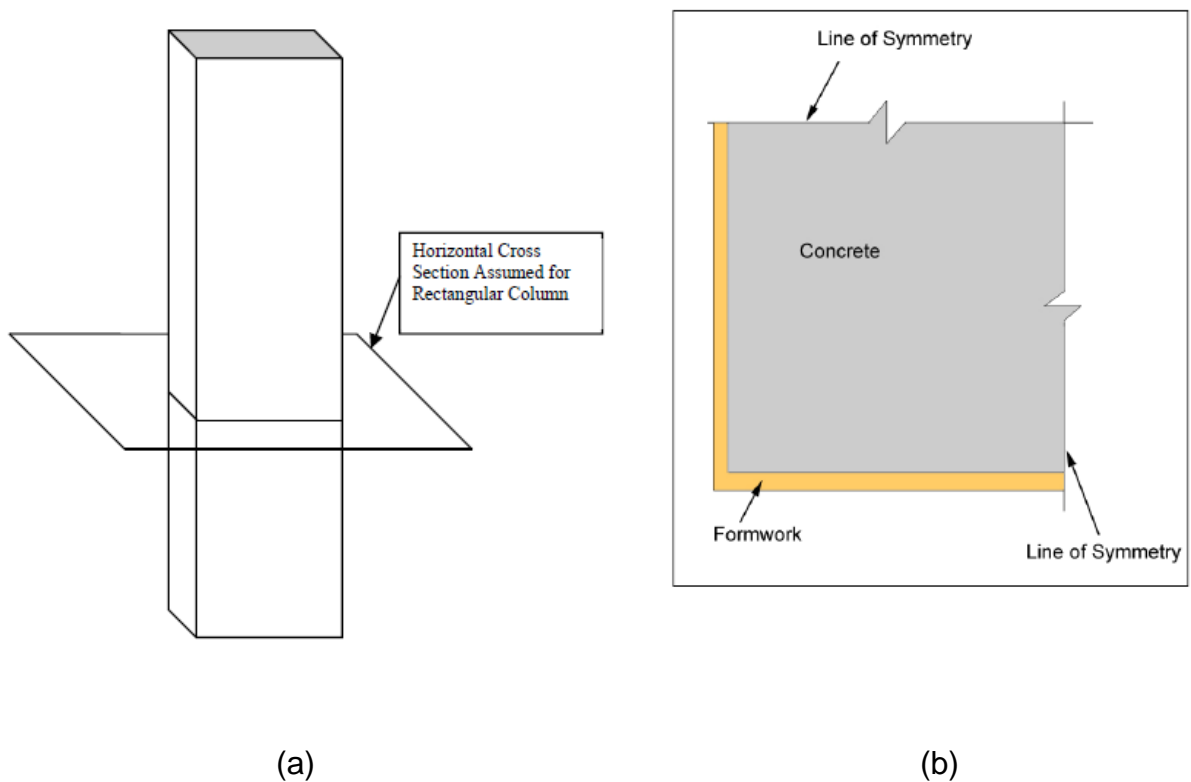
(a) Horizontal cross section of rectangular column assumed in ConcreteWorks (b) Rectangular column model used in ConcreteWorks
